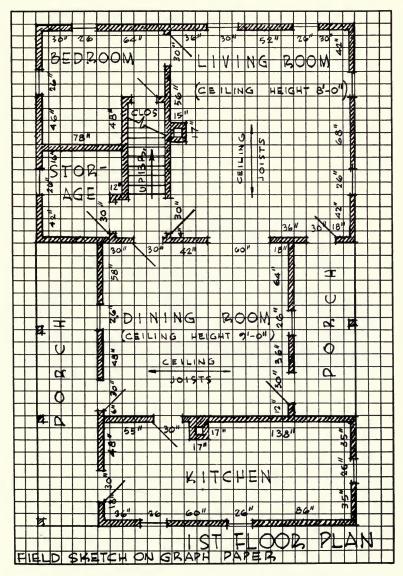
Sketch plan of existing house, with facts shown which are needed for remodeling study.
